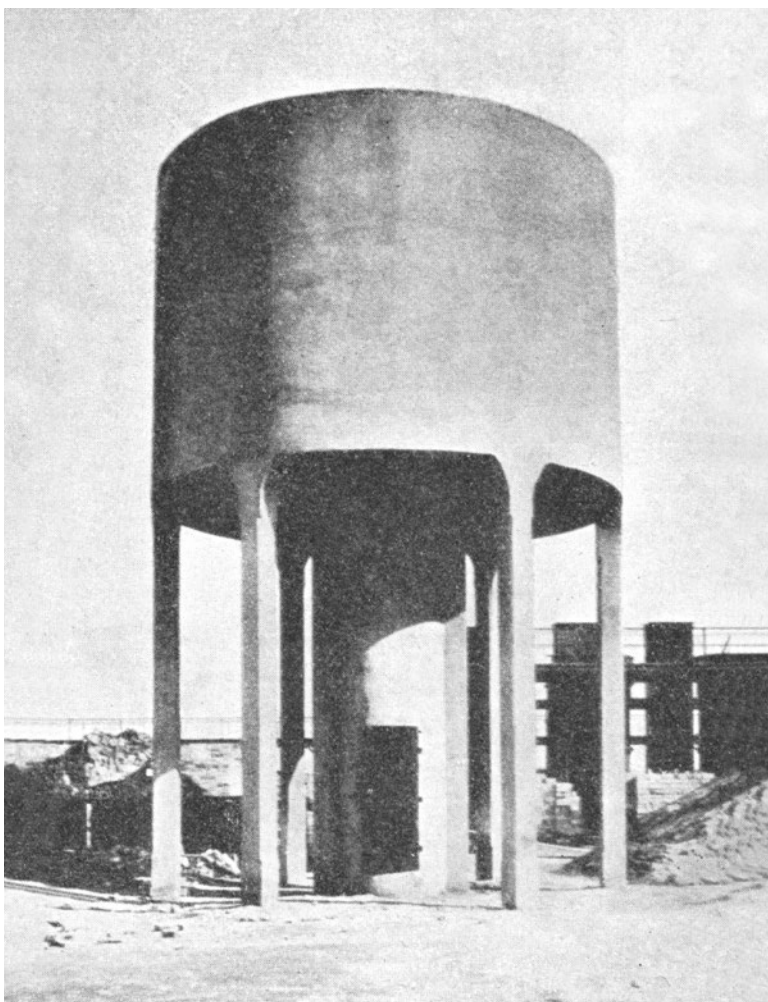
The oldest elevated water tank in our territory, during the construction of which reinforced concrete was used, was located in Holešice from 1905 [20]
